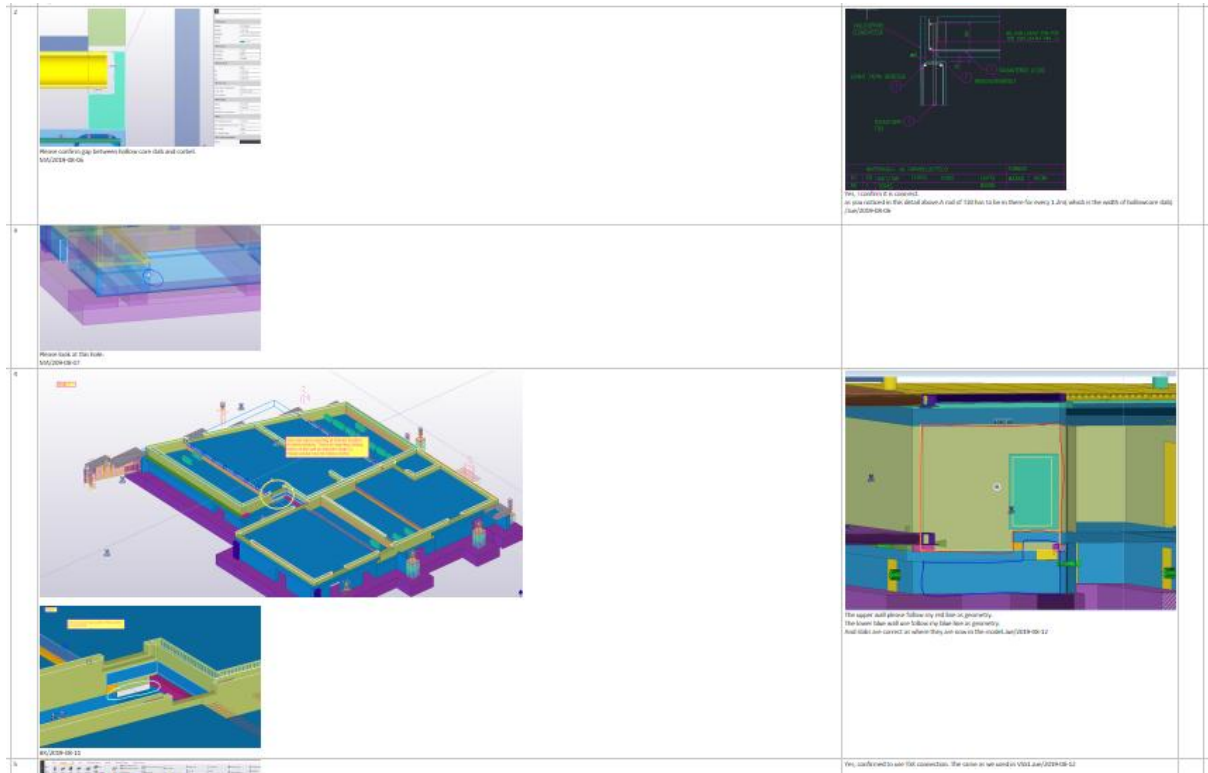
Example of modelling issue in OneNote (Problem post on left column, solved on right column)
